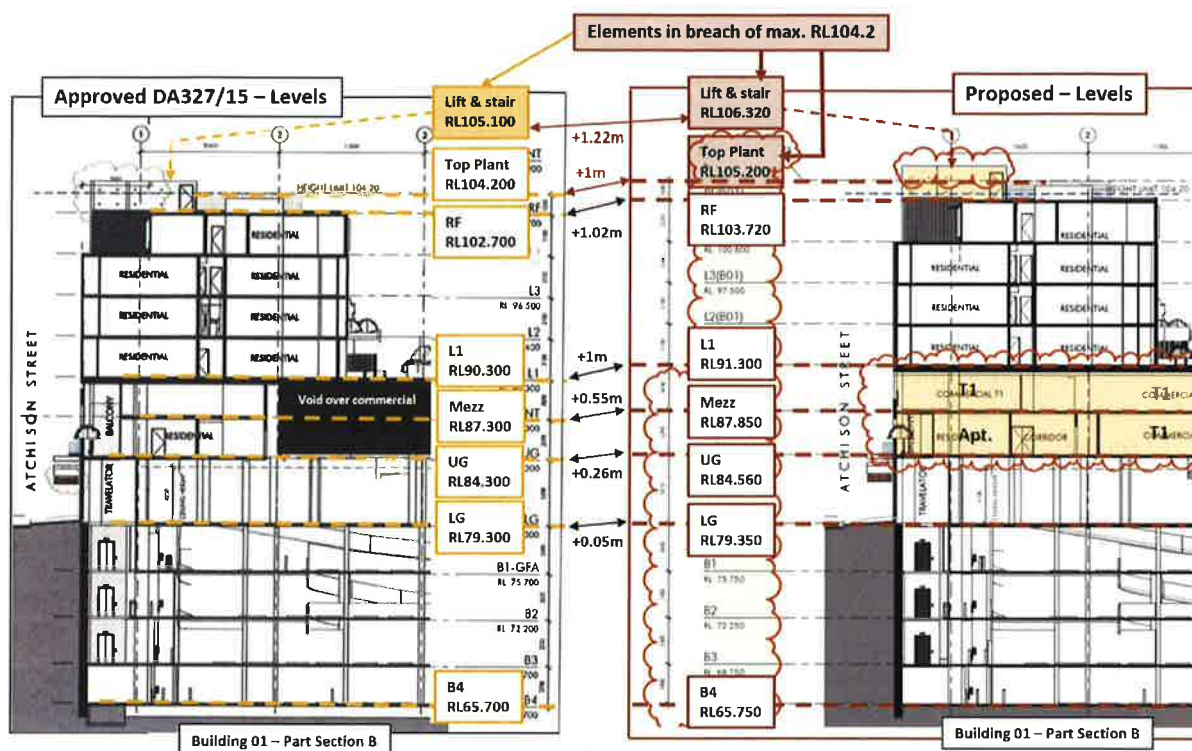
Proposed height breaches at top of plant & lift overrun & stair of Building 01
